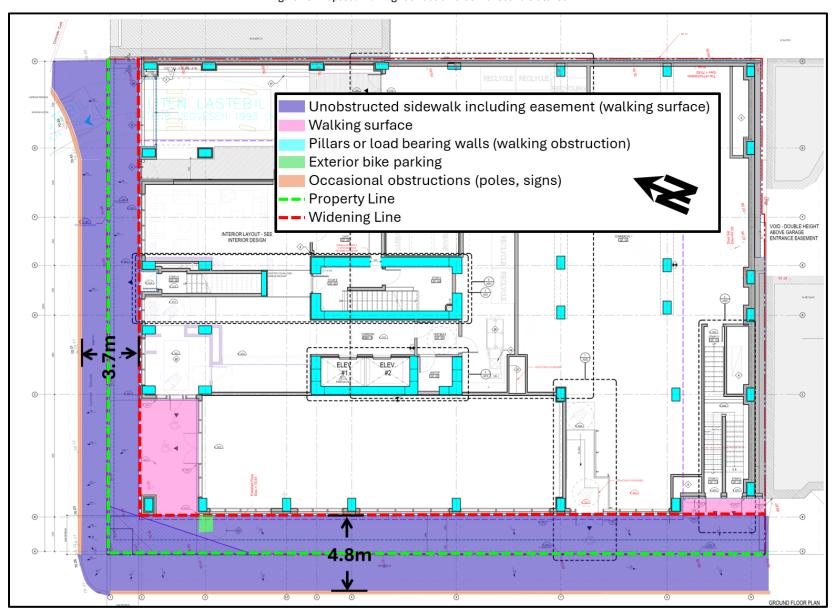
Proposed Walking Facilities on O'Connor St and Slater St
